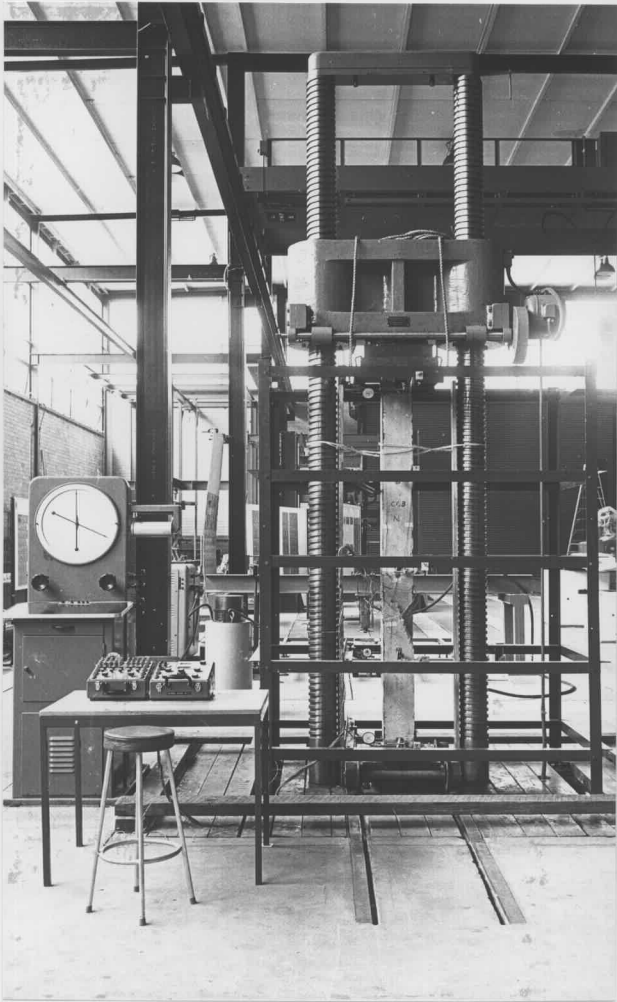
PLATE VIII TEST ARRANGEMENT FOR COLUMNS
